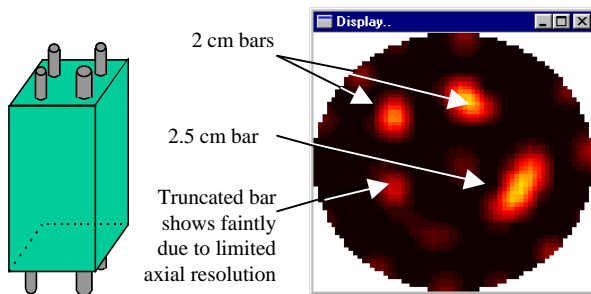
Concrete block with 4 reinforcing bars (one discontinuous); 1x2.5 cm and 2x2 cm.
